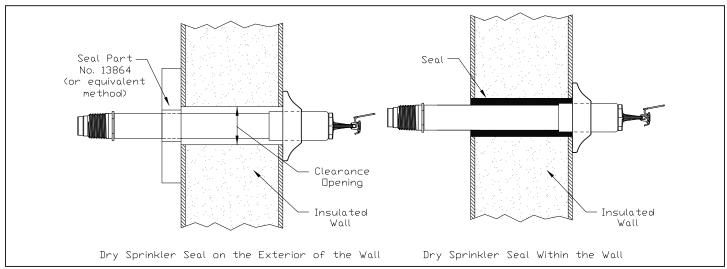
Dry Sprinkler Seal (Adjustable Standard Dry HSW Sprinkler is Shown)
